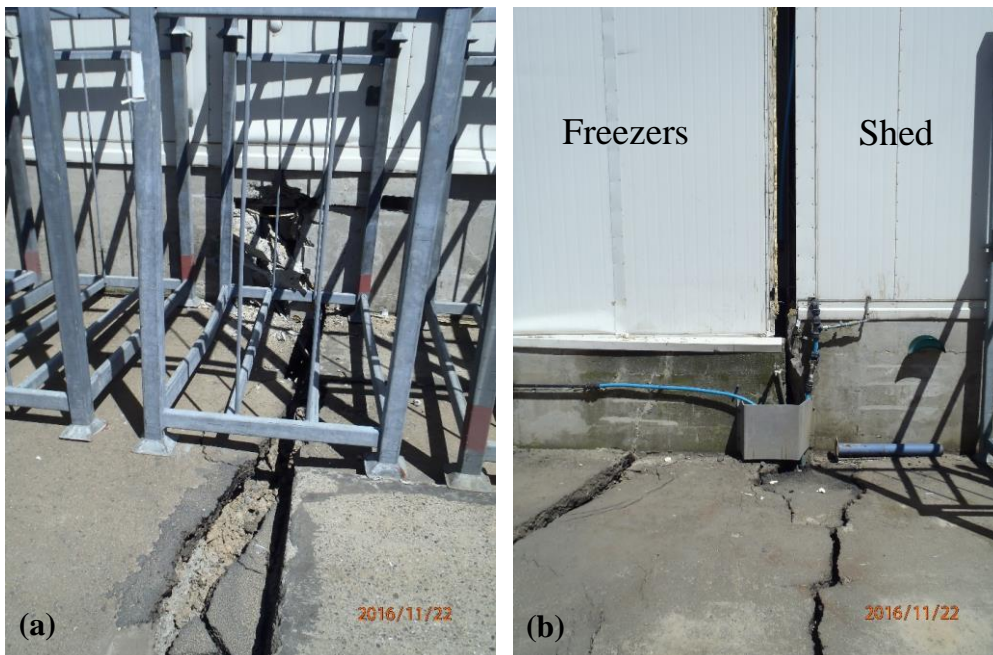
Cracks along the exterior north wall of CS building: (a) 180 mm crack in the foundation of the CS shed from westward lateral spreading (S41.280607° E174.784533°, 22NOV16), and (b) 150 mm of separation between the Shed and Freezers (i.e., westward/seaward movement of the Shed relative to the Freezers), (S41.280584° E174.784705°, 22NOV16).
